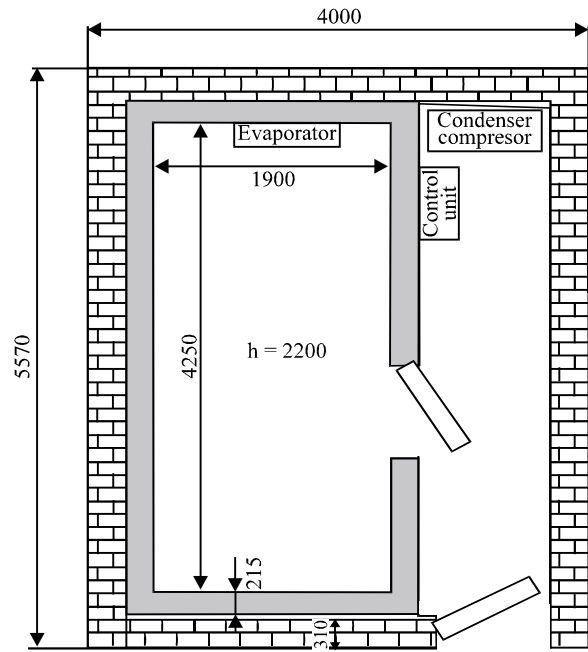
Schematic view of the experimental cold store (dimensions in mm)
